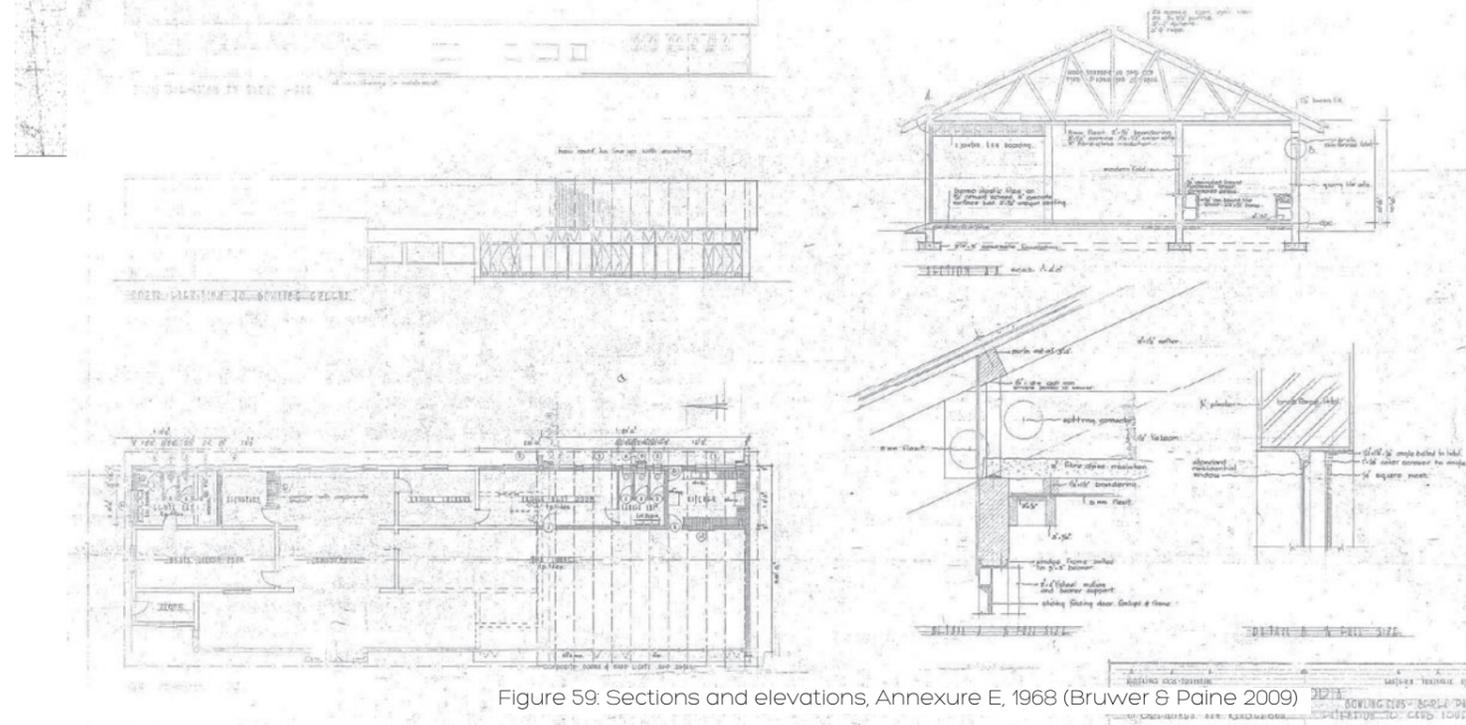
Sections and elevations, Annexure E, 1968 (Bruwer & Paine 2009)
